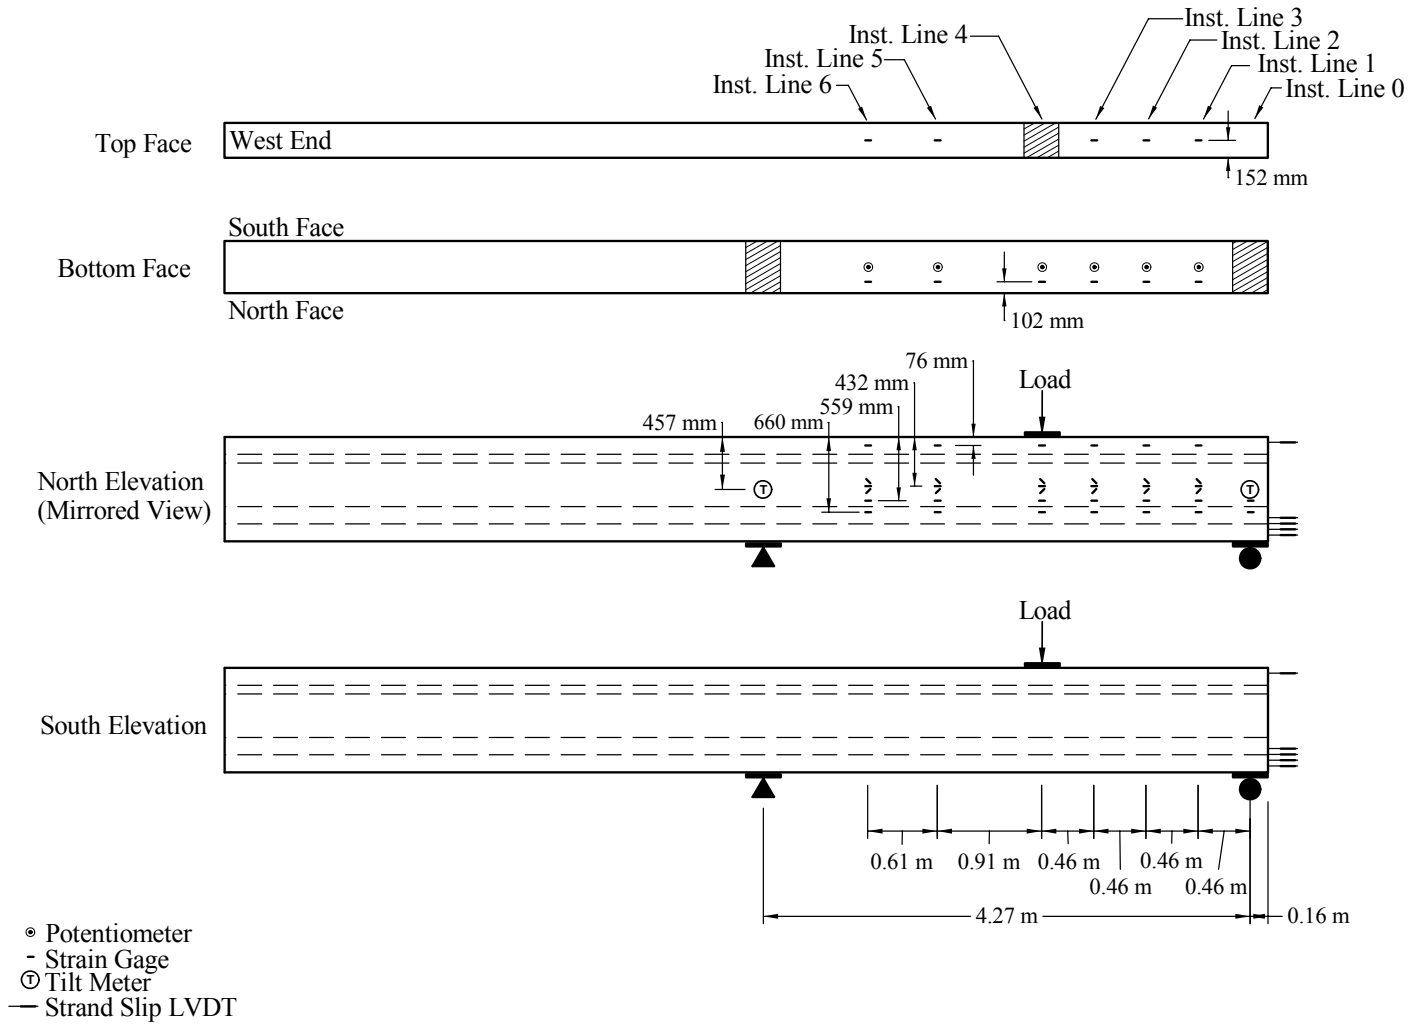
Illustration. Instrumentation plan for Girder 14S.
